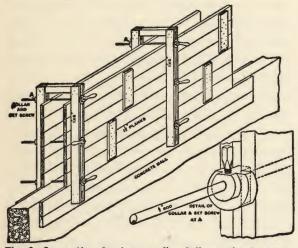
Suggestion for barn wall. Collar and set screw method of holding wall forms in position.
